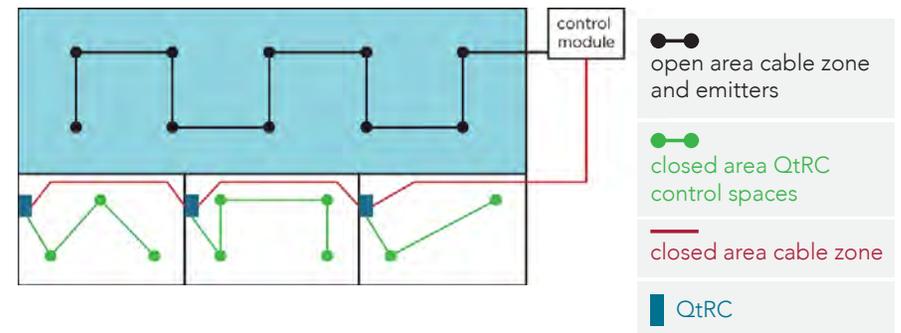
Possible layouts for Qt-RC3 controlled rooms
